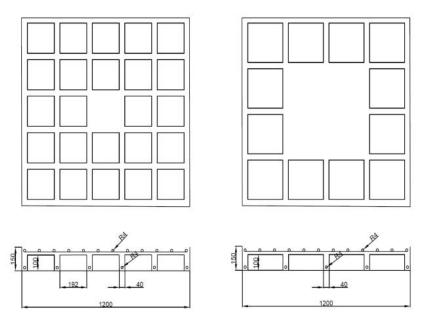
Detailed plan and cross-sectional view of waffle slab model 2 and model.
